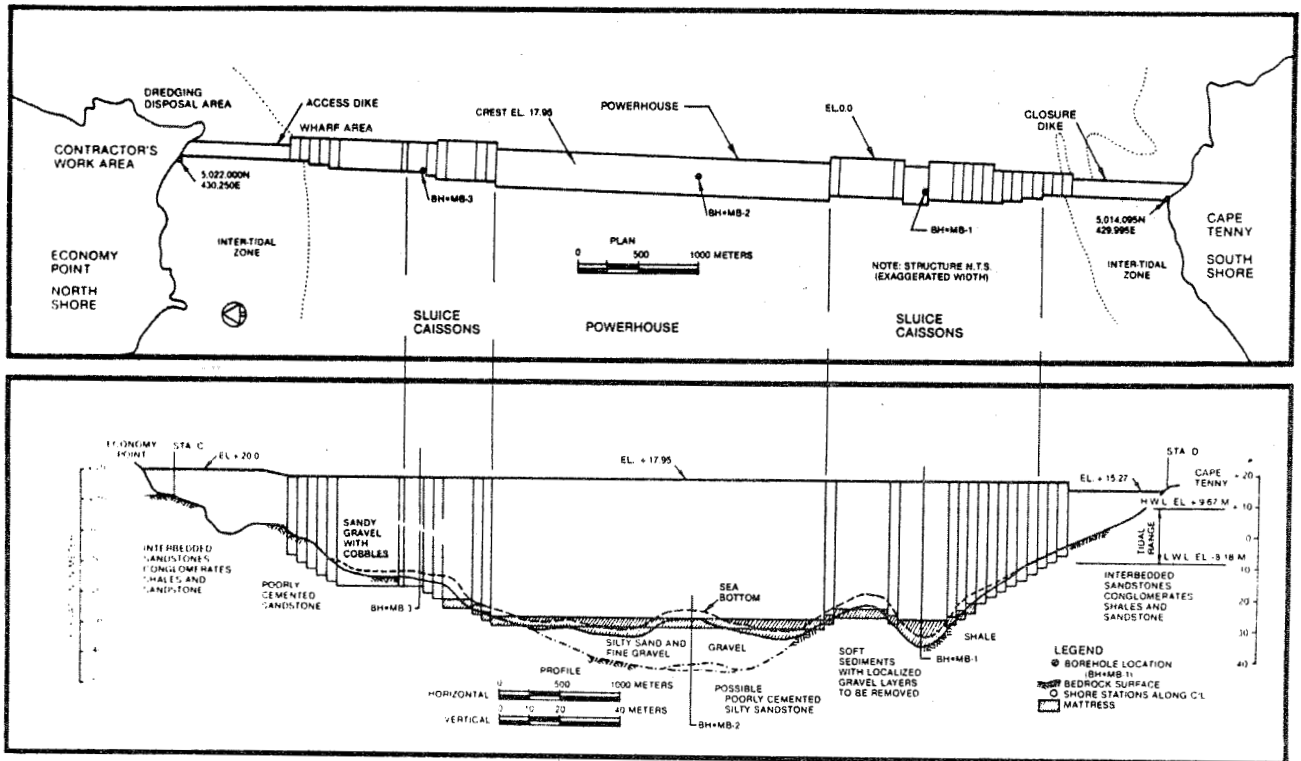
Proposed barrage plan and elevation for the B9 project.
